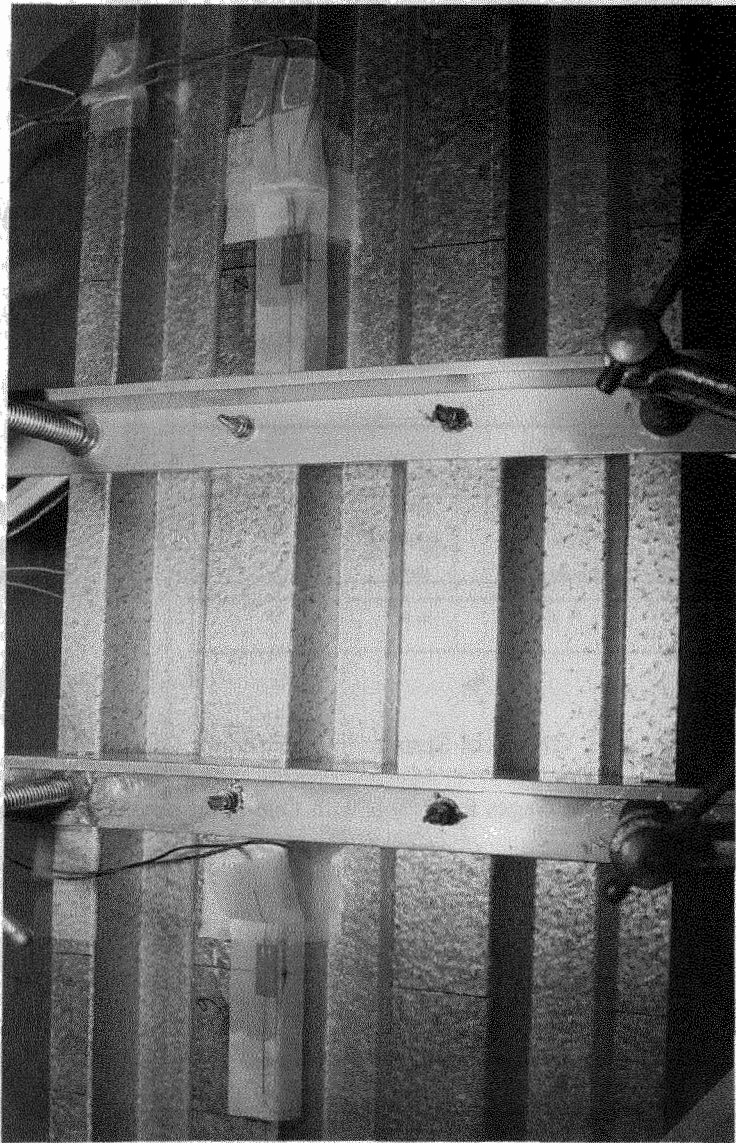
Specimen with Screws Penetrating through Tension Flanges (Continued)
